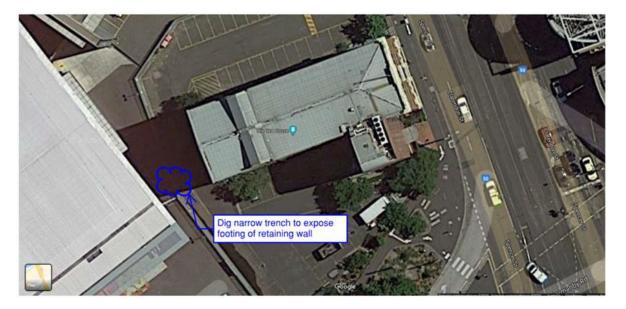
Location of narrow test pit along site boundary to investigate the footing of the retaining wall on the neighbouring site
